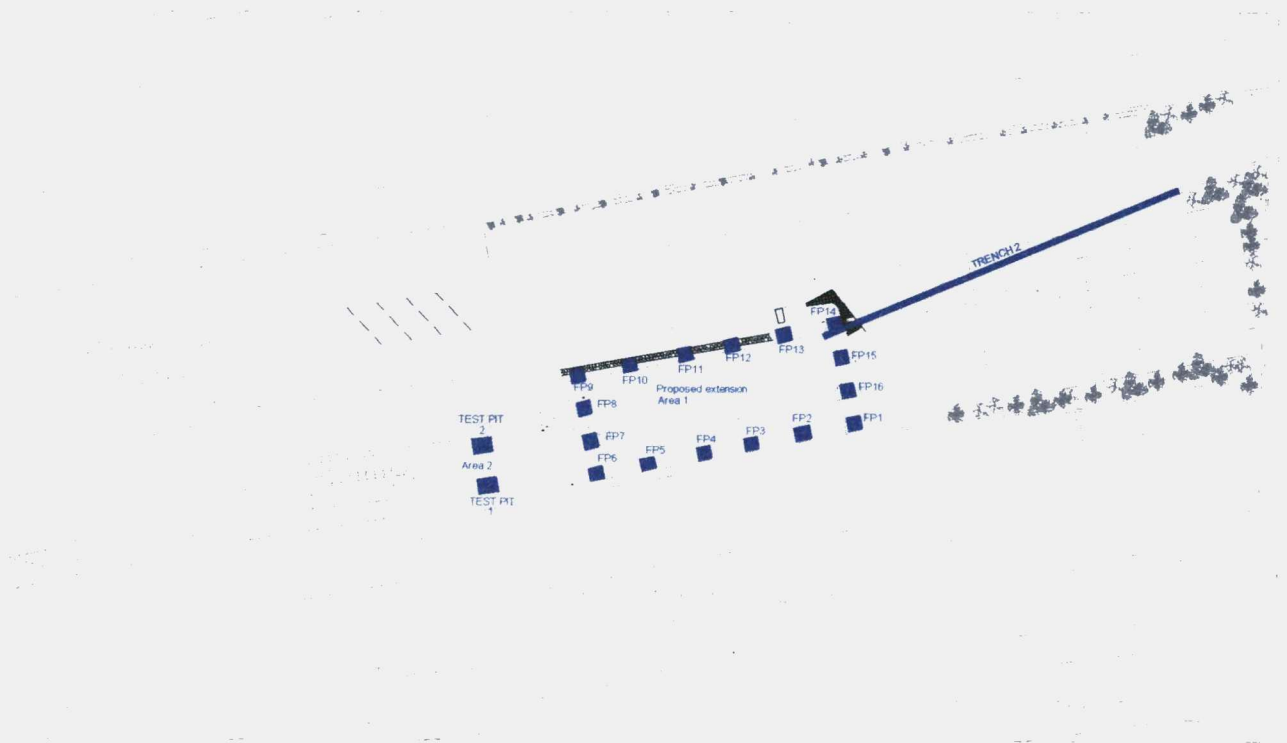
Site location showing positions of areas 1 & 2, test pits & foundation pits. (Not to scale).
